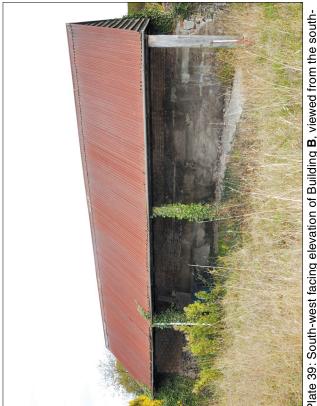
South-west facing elevation of Building B, viewed from the south-west
